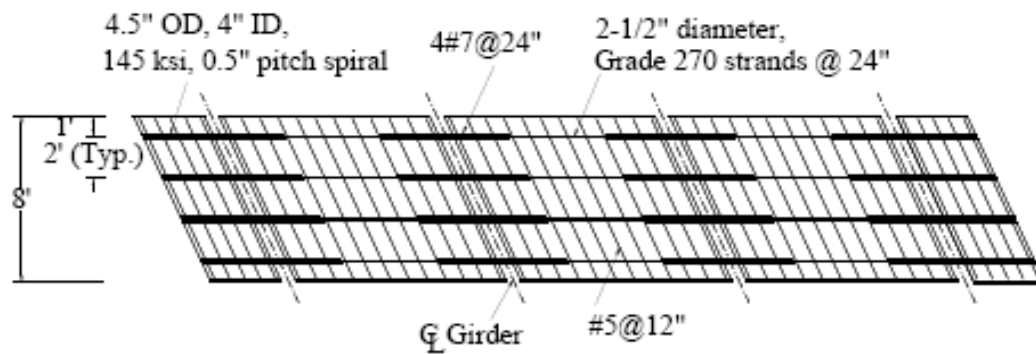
Plan View of Typical Prestressed NUDECK Panel
